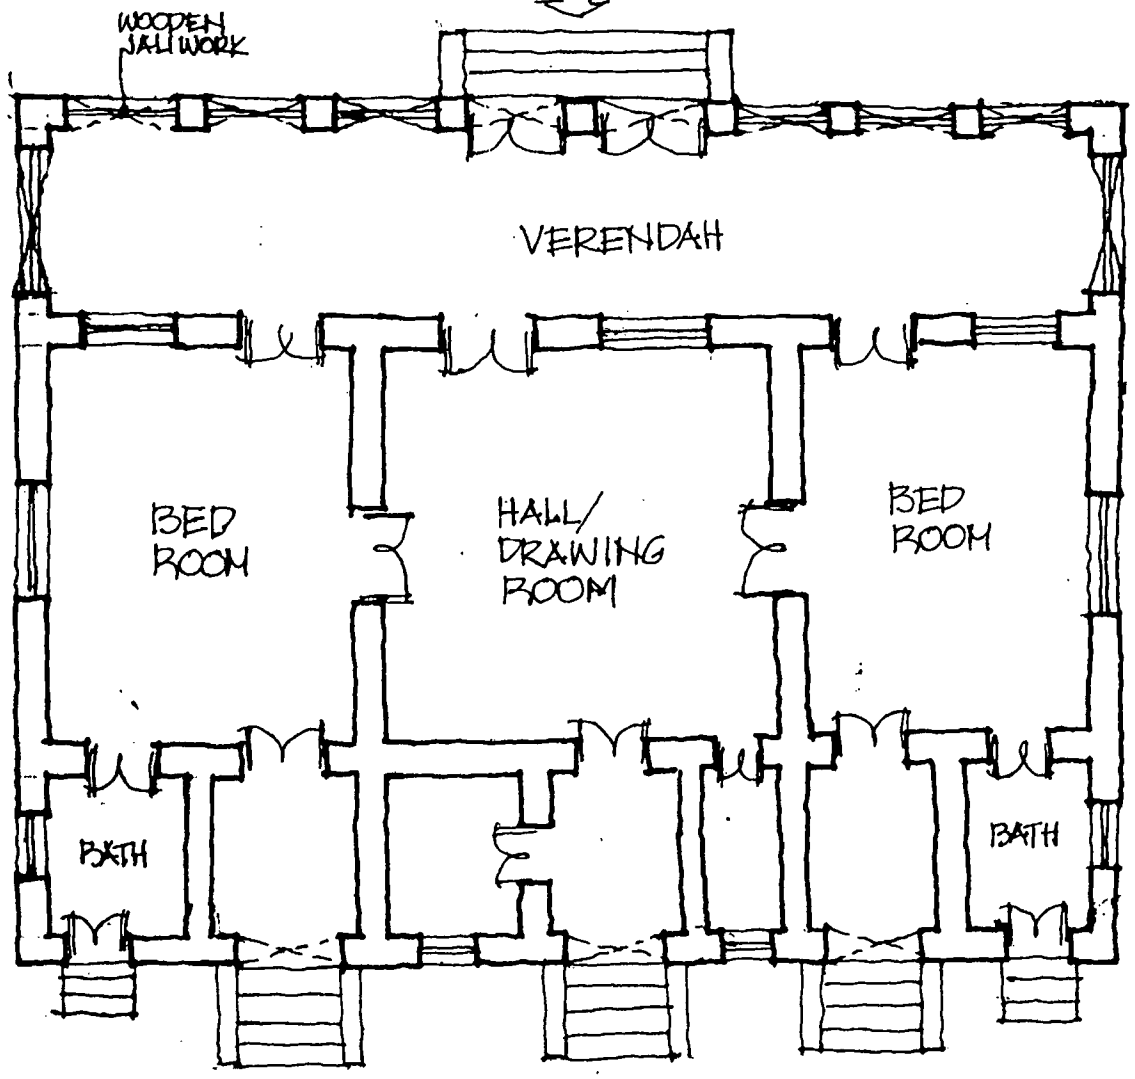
Ground floor plan, Railway bungalow no-66, Fulbaria railway colony, Dhaka
